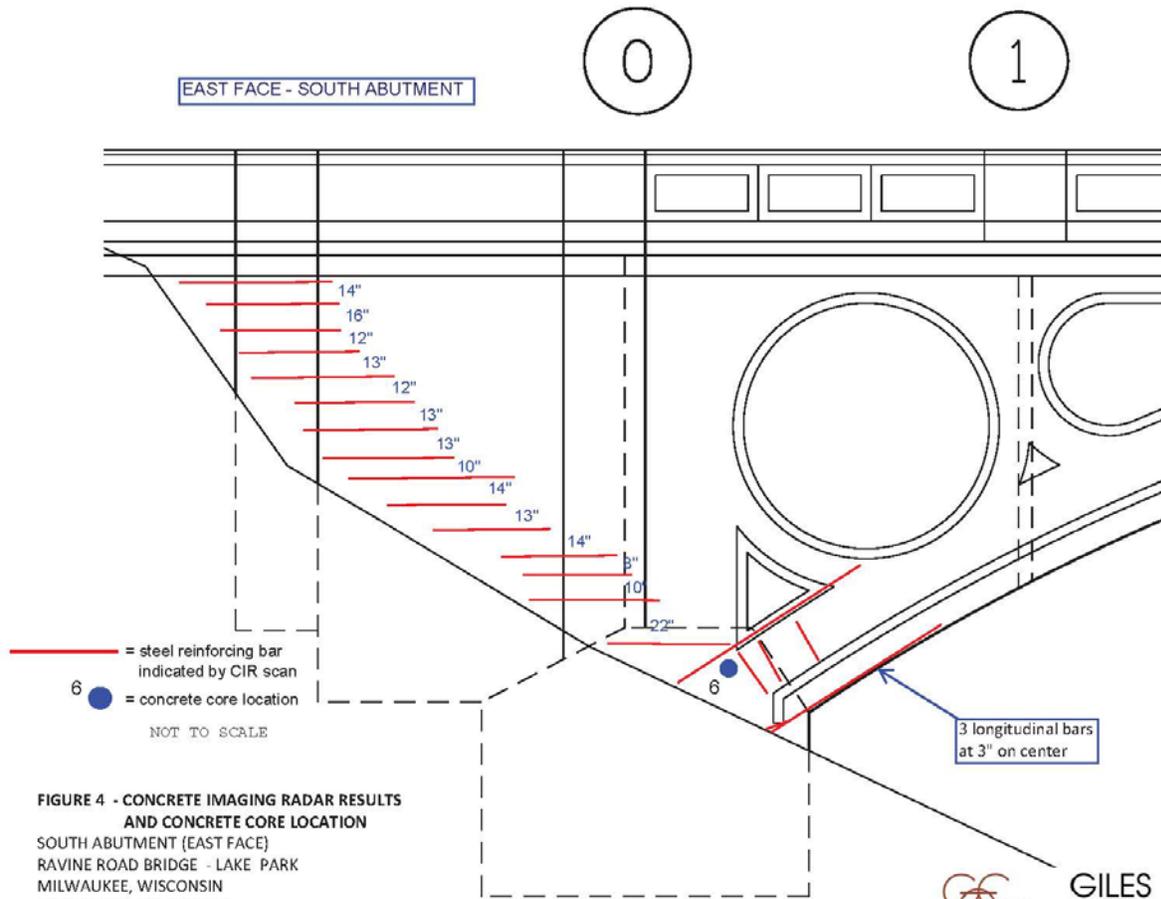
CONCRETE IMAGING RADAR RESULTS AND CONCRETE CORE LOCATION
